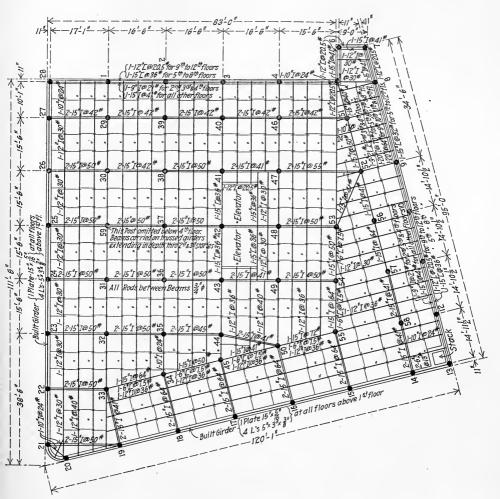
Typical floor plan, Everard warehouse, New York City.
